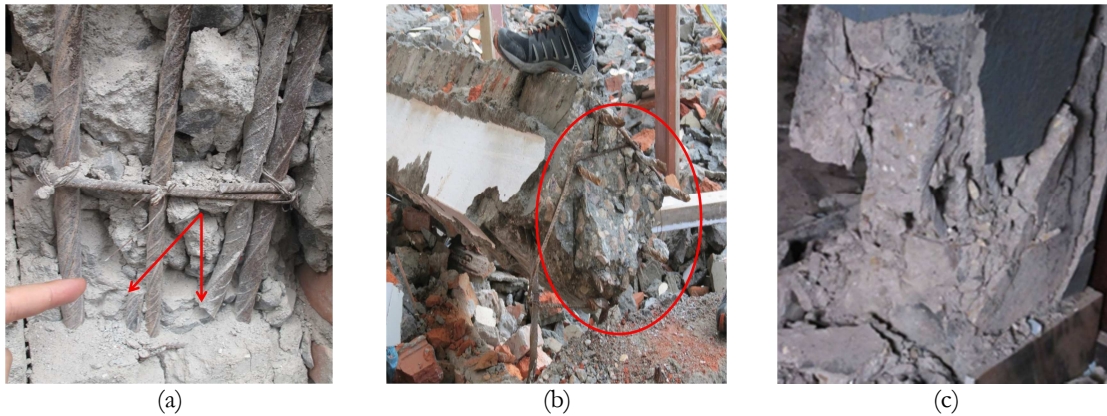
Failure of the structural elements caused by; (a) Insufficient lapping length, (b) All reinforcement lapped at the same section and (c) Poor concrete quality and confinement
